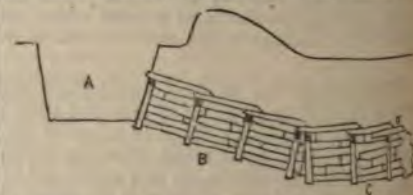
Mine supported by Frames, in process of construction from a Trench: A, trench; B, descending gallery; C, gallery; a, railing placed not yet pushed out to its full length.
